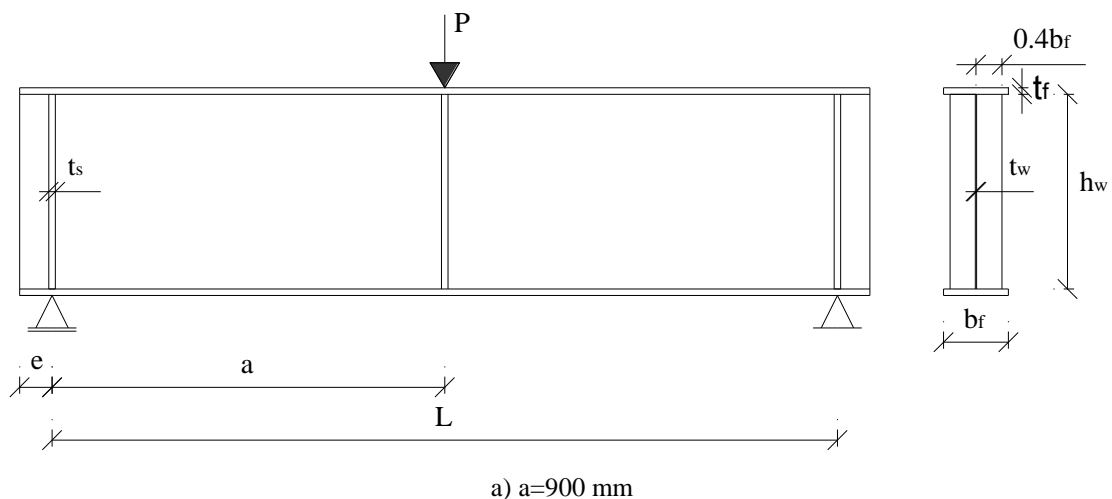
Geometry of the plate girders tested by Lee and Yoo
